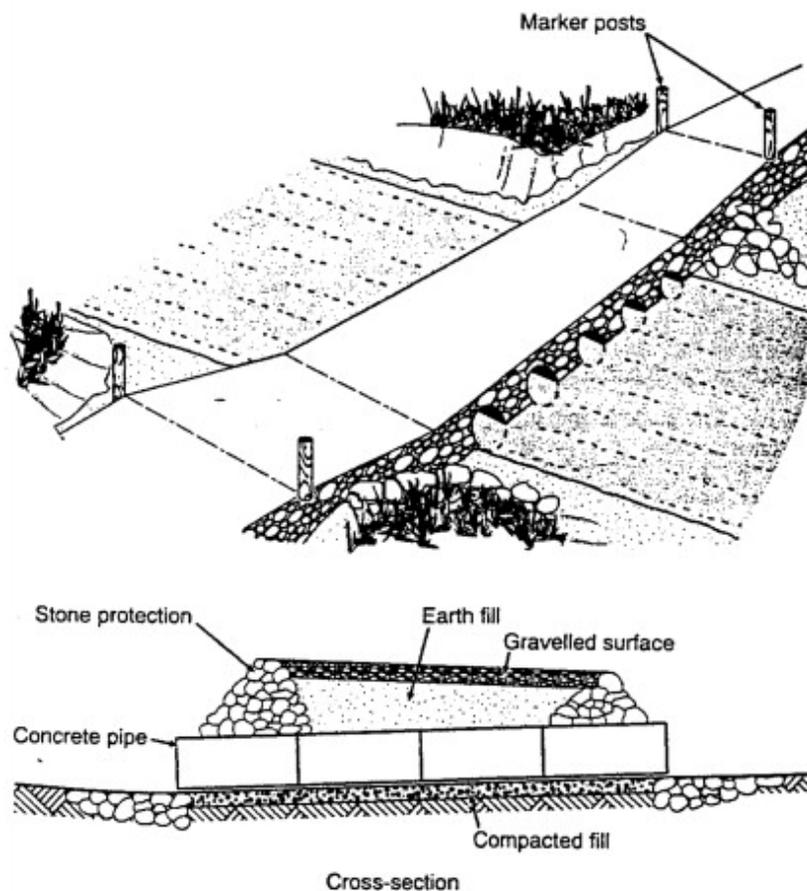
Schematic of armoured ford (Hazeltine & Bull, 2003). At Jason Creek, twin culverts with a concrete road surface and a grizzly rack upstream of the crossing could be used.
